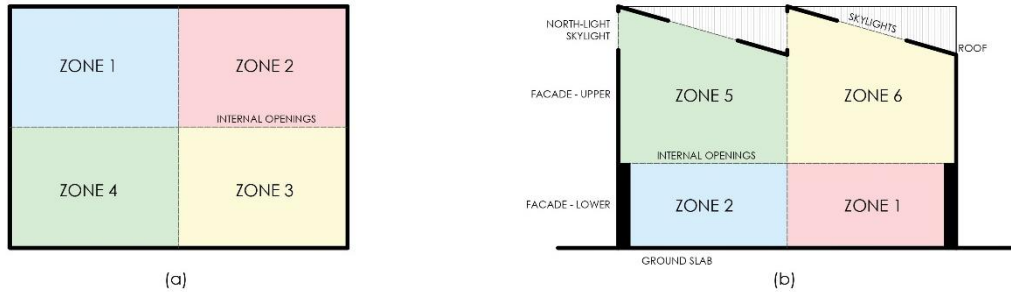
Diagrams showing zone separation in (a) plan and in (b) section.
